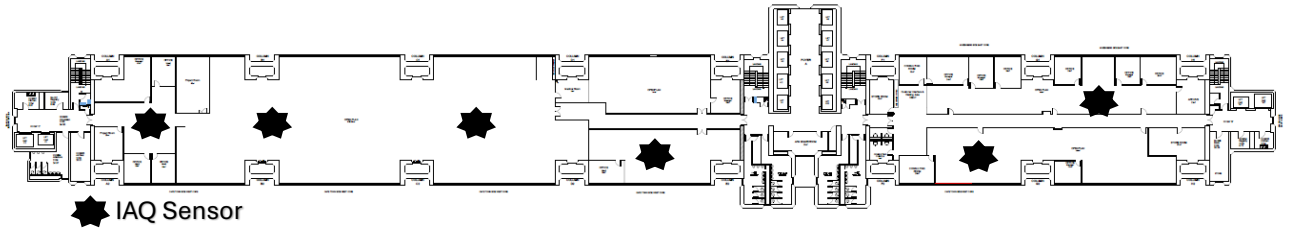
Tower Building proposed sensor positioning 10th floor (6)
